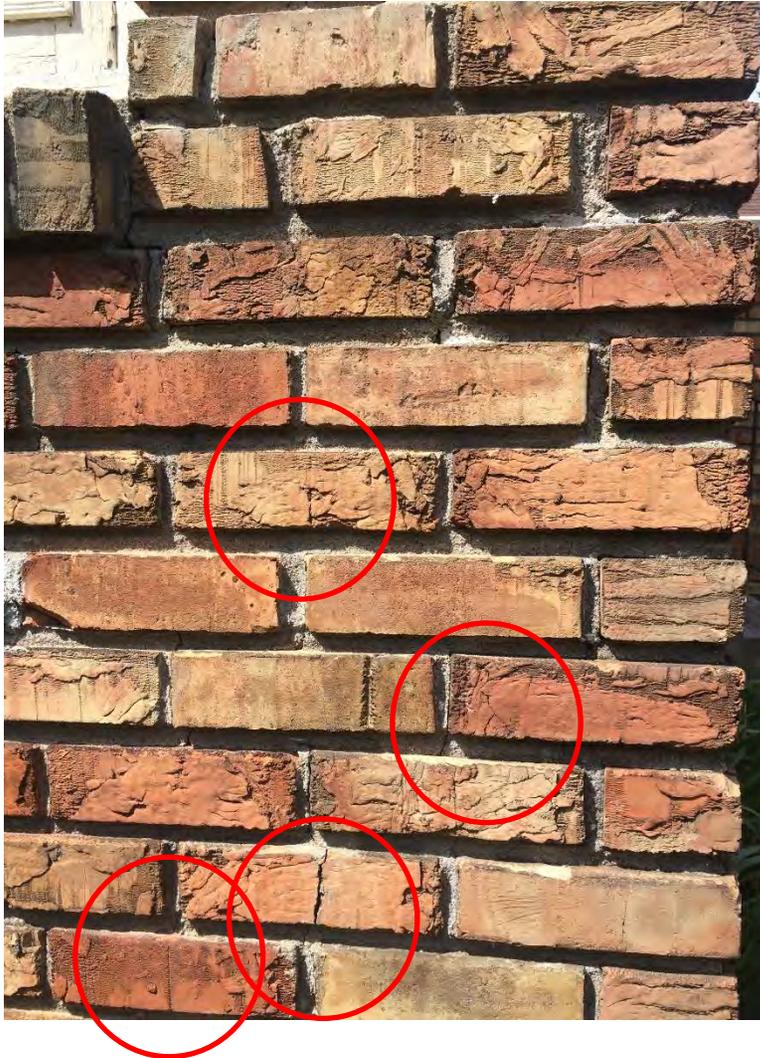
Close-up of wall section showing existing multi-color/multi-texture brick
